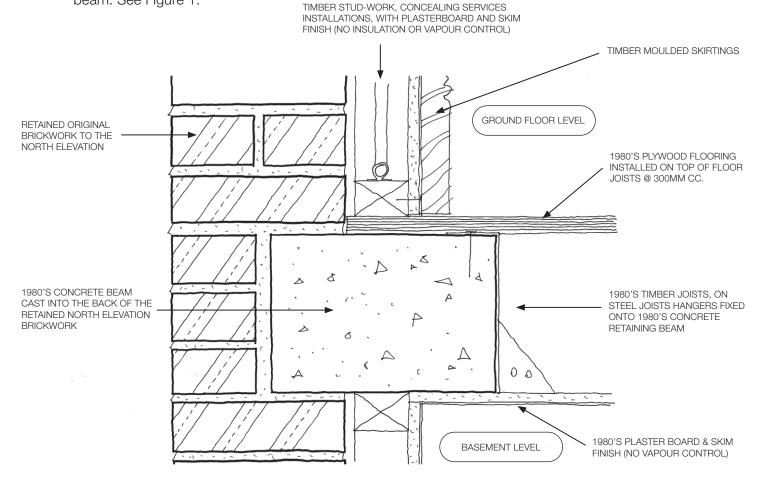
Existing junction between the original fabric of the north elevation and 1980's retaining / floor structures
